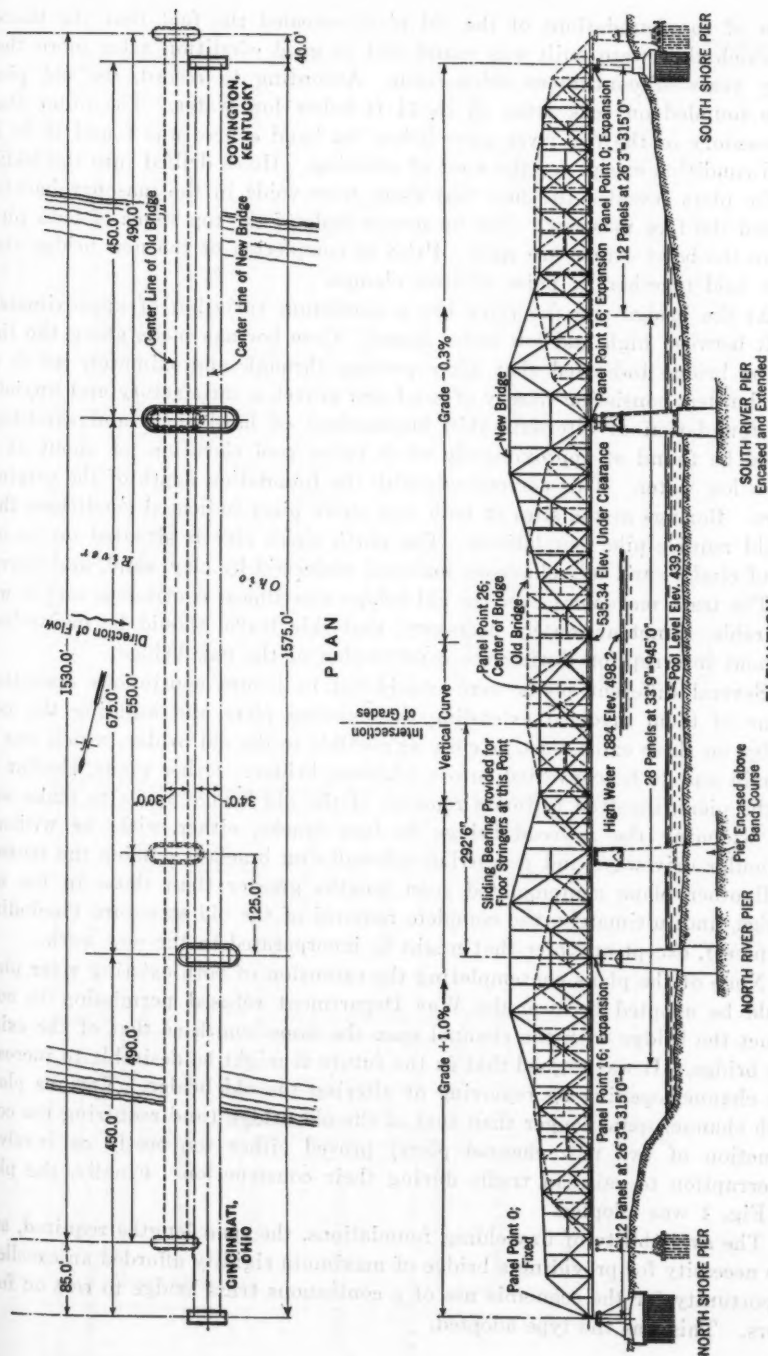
PLAN AND ELEVATION OF BRIDGE
